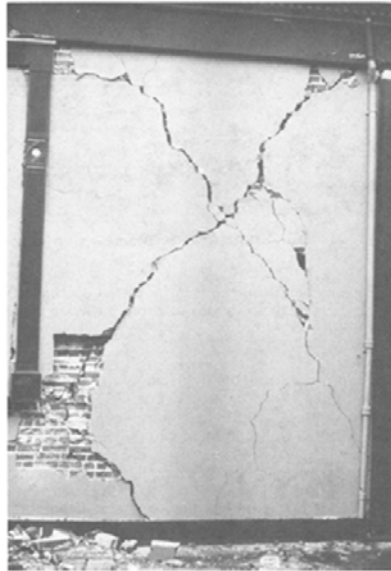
In-Plane Shear Failure of URM Masonry Wall (Santa Cruz, Loma Prieta Earthquake)
